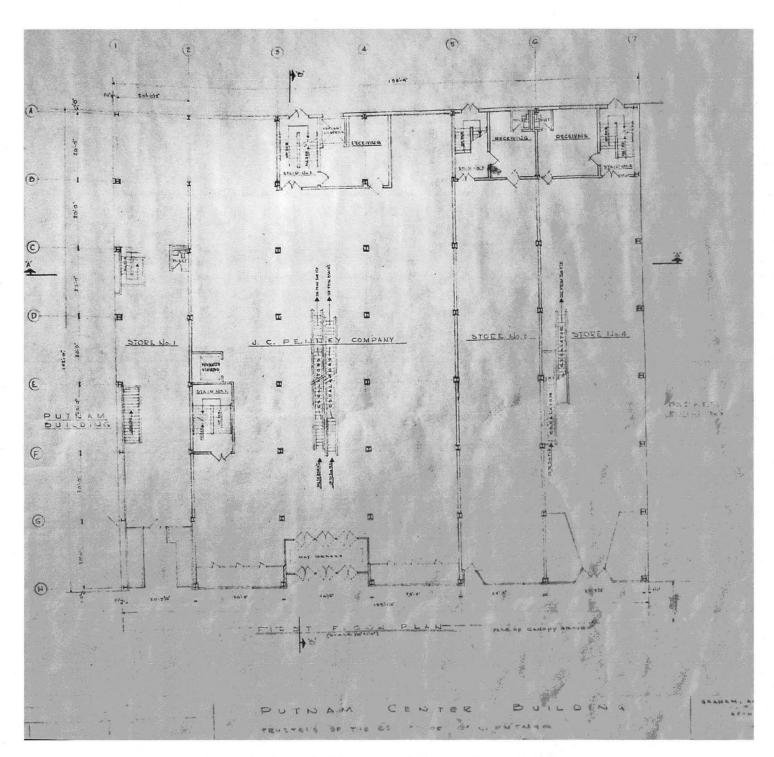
Layout of first story of Putnam Center Building (Putnam Trust collection, unprocessed drawings).
